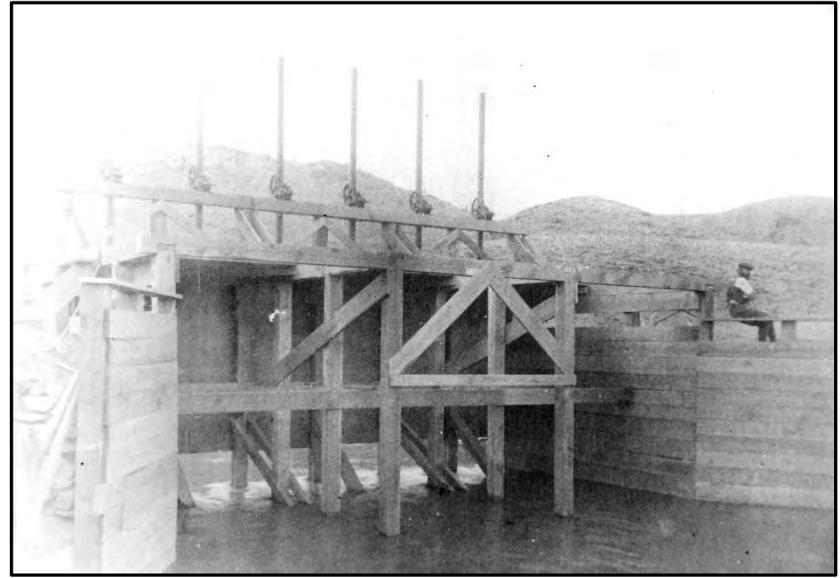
Undated historical photograph of a simple wooden outlet structure. Irrigation ditch gate, Wyoming Game & Fish Department Collection, Pg8-31/2051, Wyoming State Archives.
